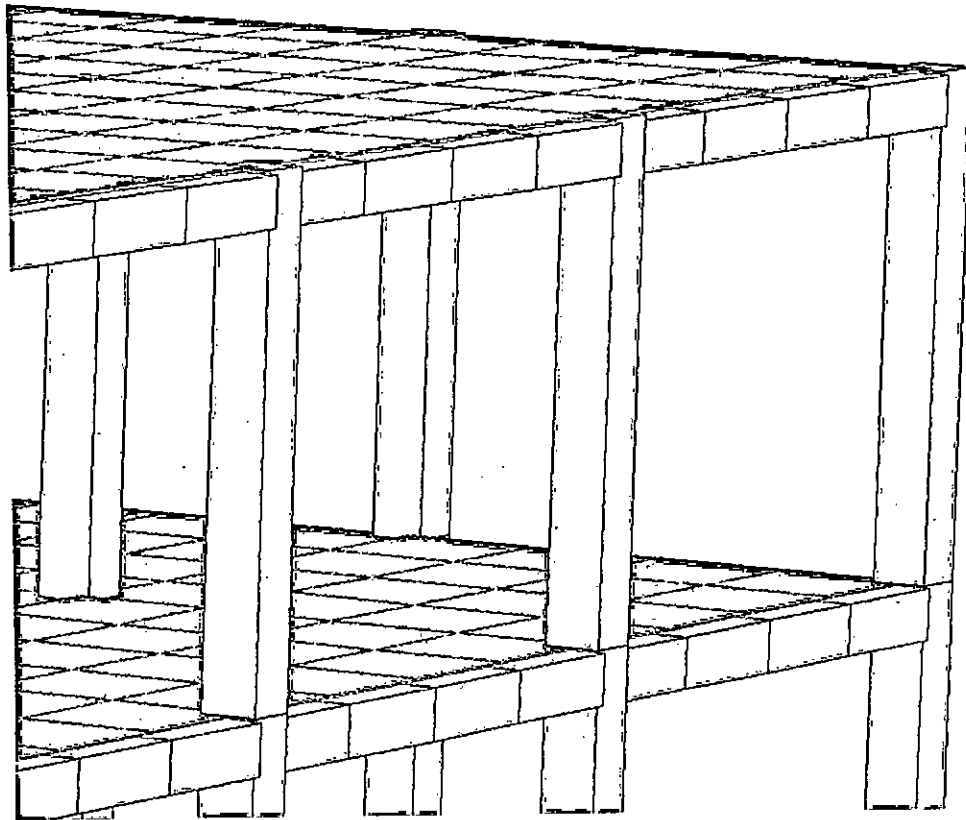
A Close Up View of a Corner to Highlight the Beam Offsets to Simulate T beam Action.
